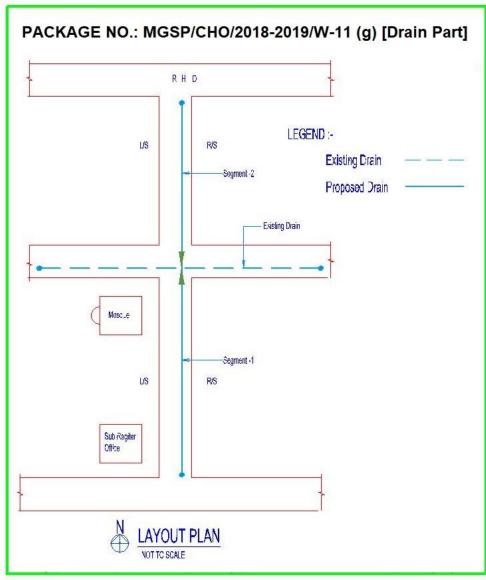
(g-ii): Layout Plan of the proposed Subproject area from Sub Register office to Halkakara beri bundh via Baitur Rahmat Jame mosjid [Drain part]
